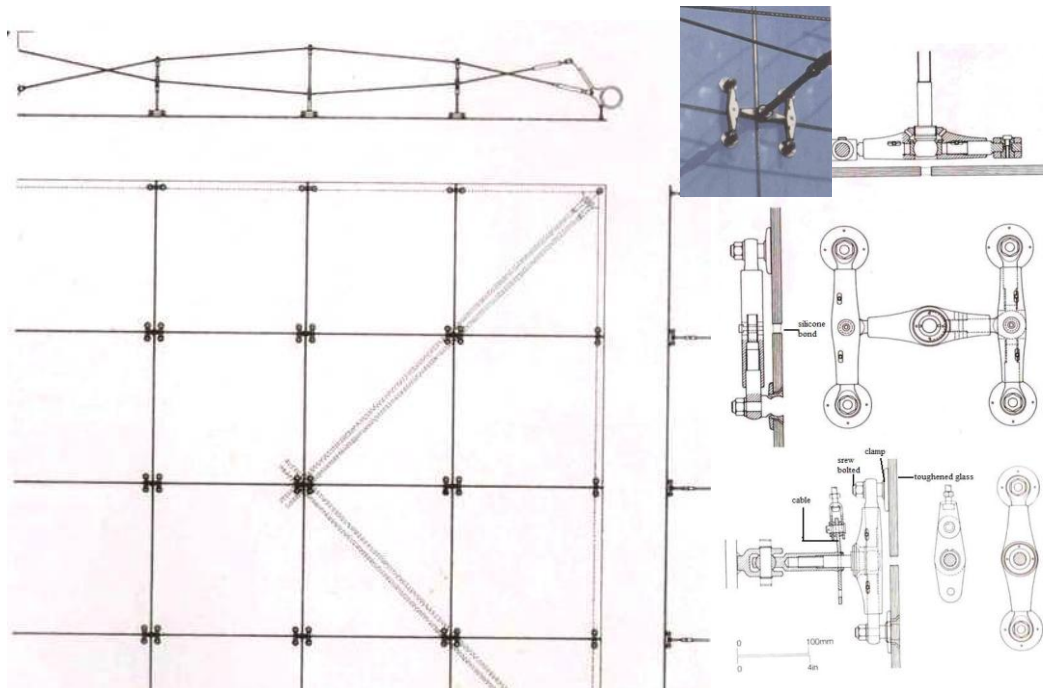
Anchorage Detail of Articulated 4-Point 'H' Connector (Michael, W. 1996).
